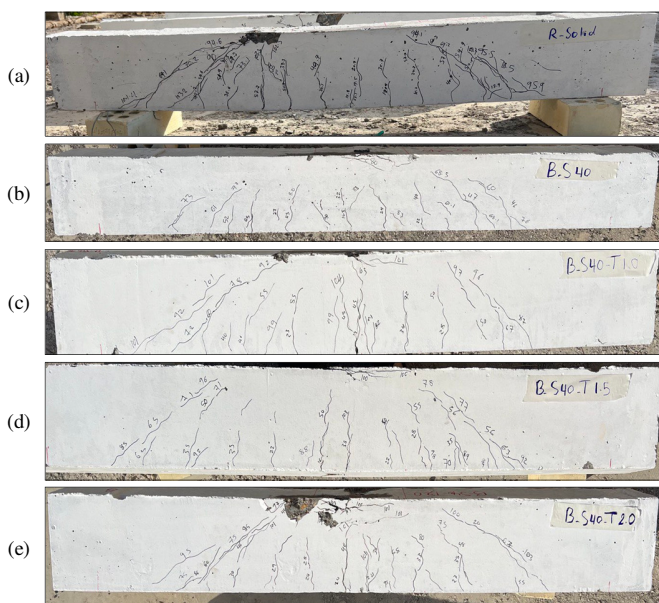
Crack patterns at failure for (side view) (a) R-solid specimen, (b) B-S40 specimen, (c) B-S40-T1 specimen, (d) B-S40-T1.5 specimen, (e) B-S40-T2 specimen.
